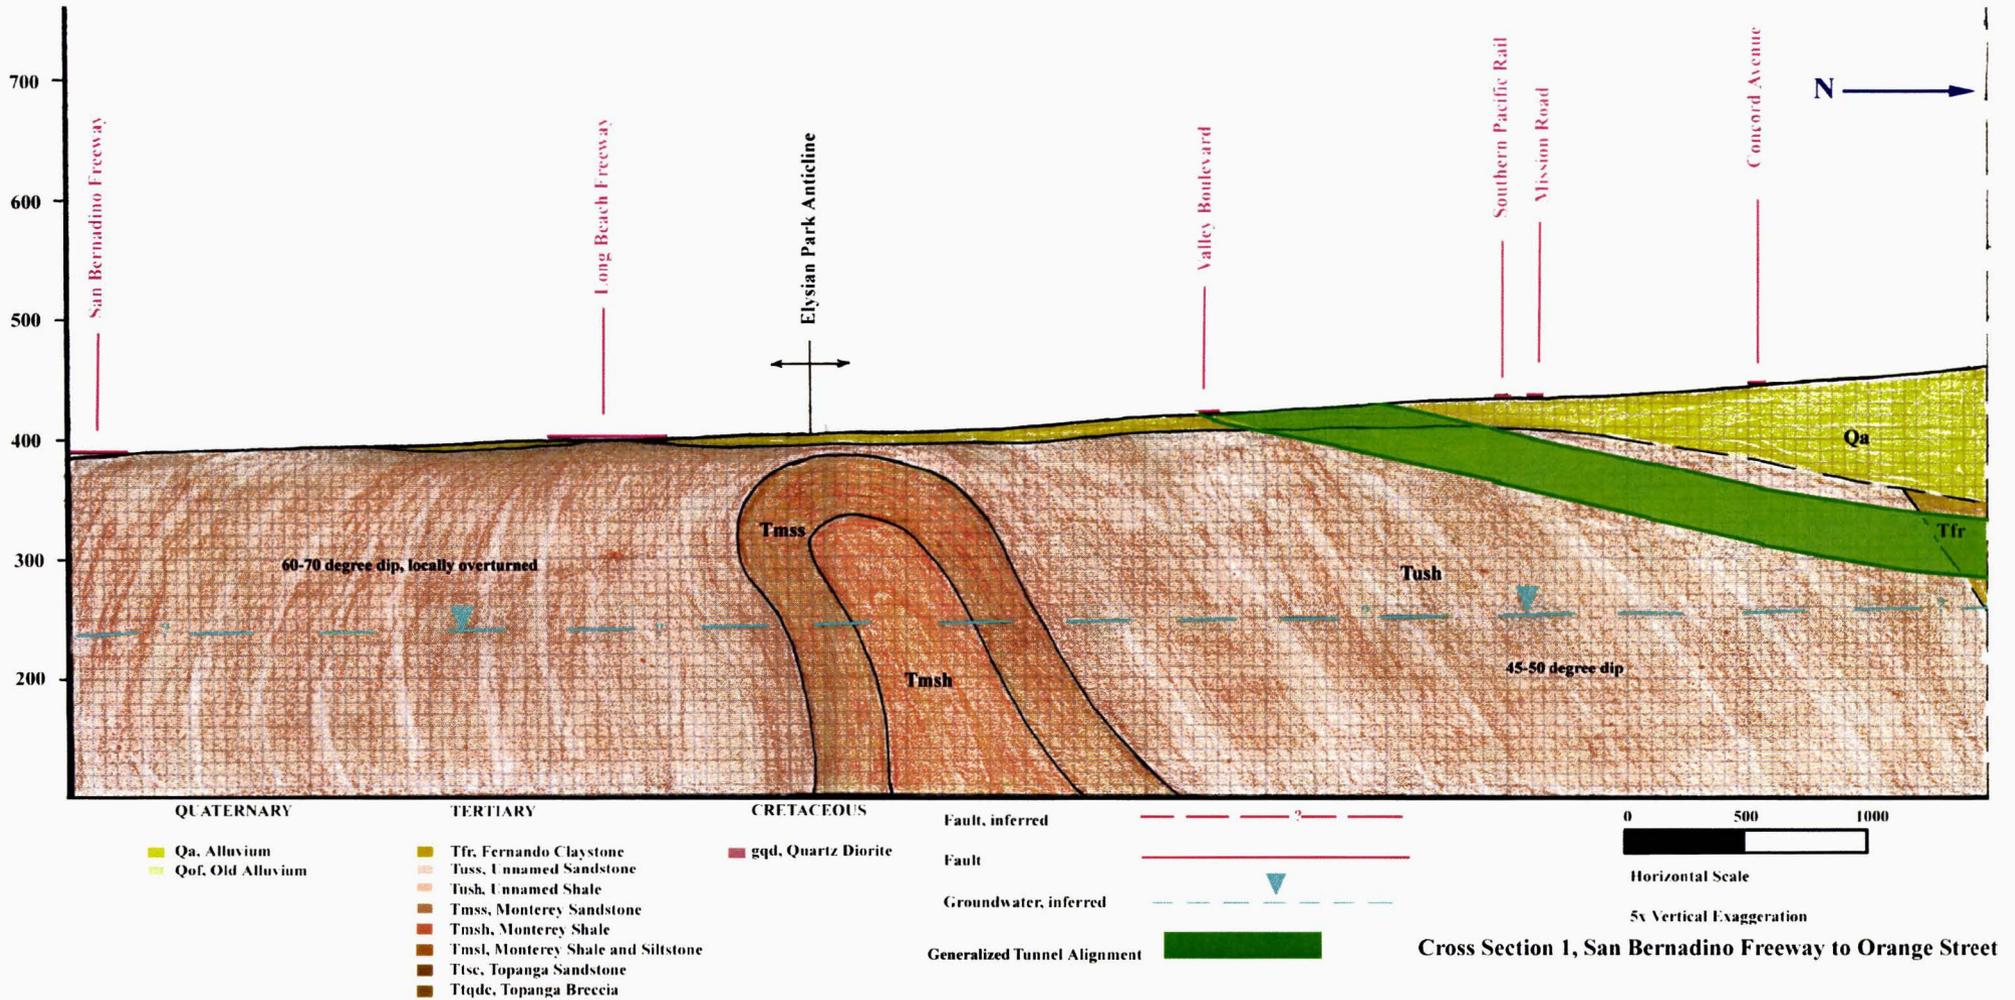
Longitudinal Cross Section, San Bernardino Freeway to Orange Street.
